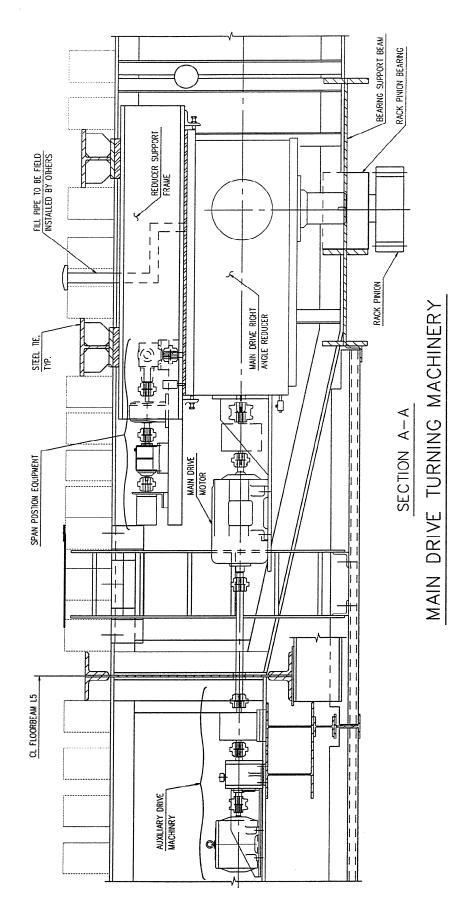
Cross Section View of the Main Drive Turning Machinery
